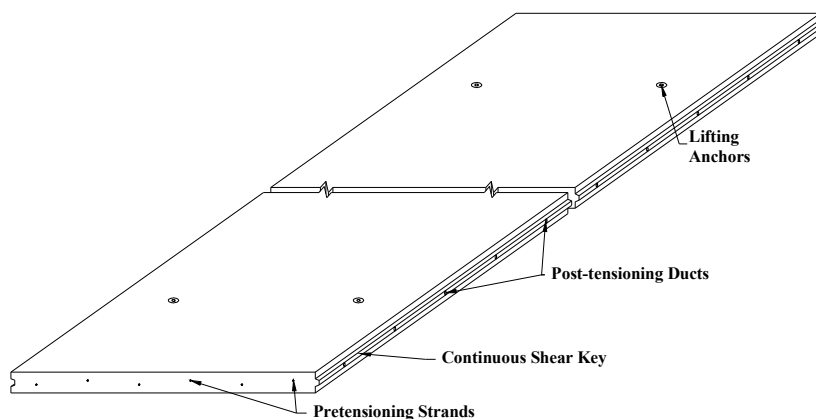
Typical Precast Prestressed Concrete Pavement Panel (Base Panel).
